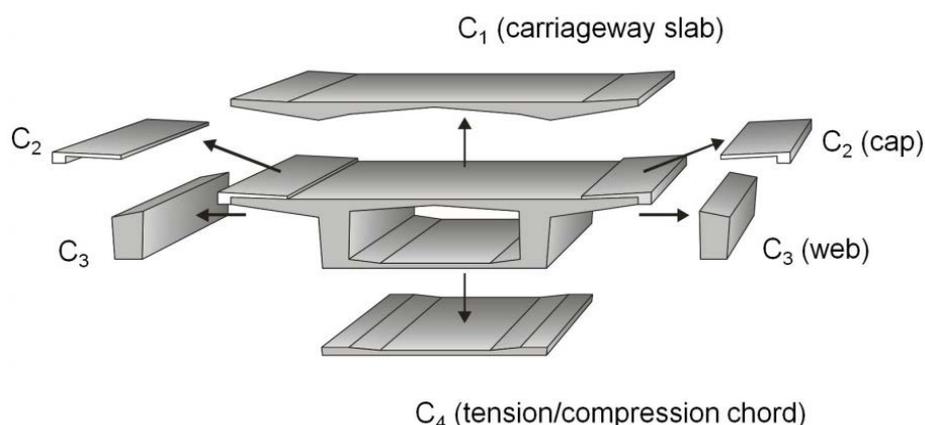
Schematic illustration of a component subdivision of a bridge superstructure (box girder bridge)
